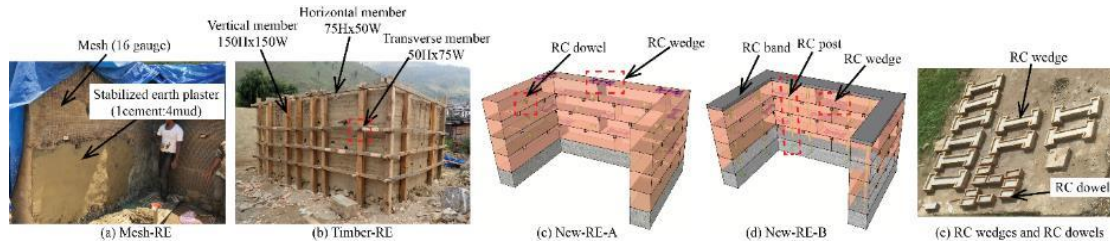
Specimen showing strengthening details: (a) Mesh-RE; (b) Timber-RE; (c) New-RE-A; (d) New-RE-B; (e) RC wedges and RC dowels inside formwork
